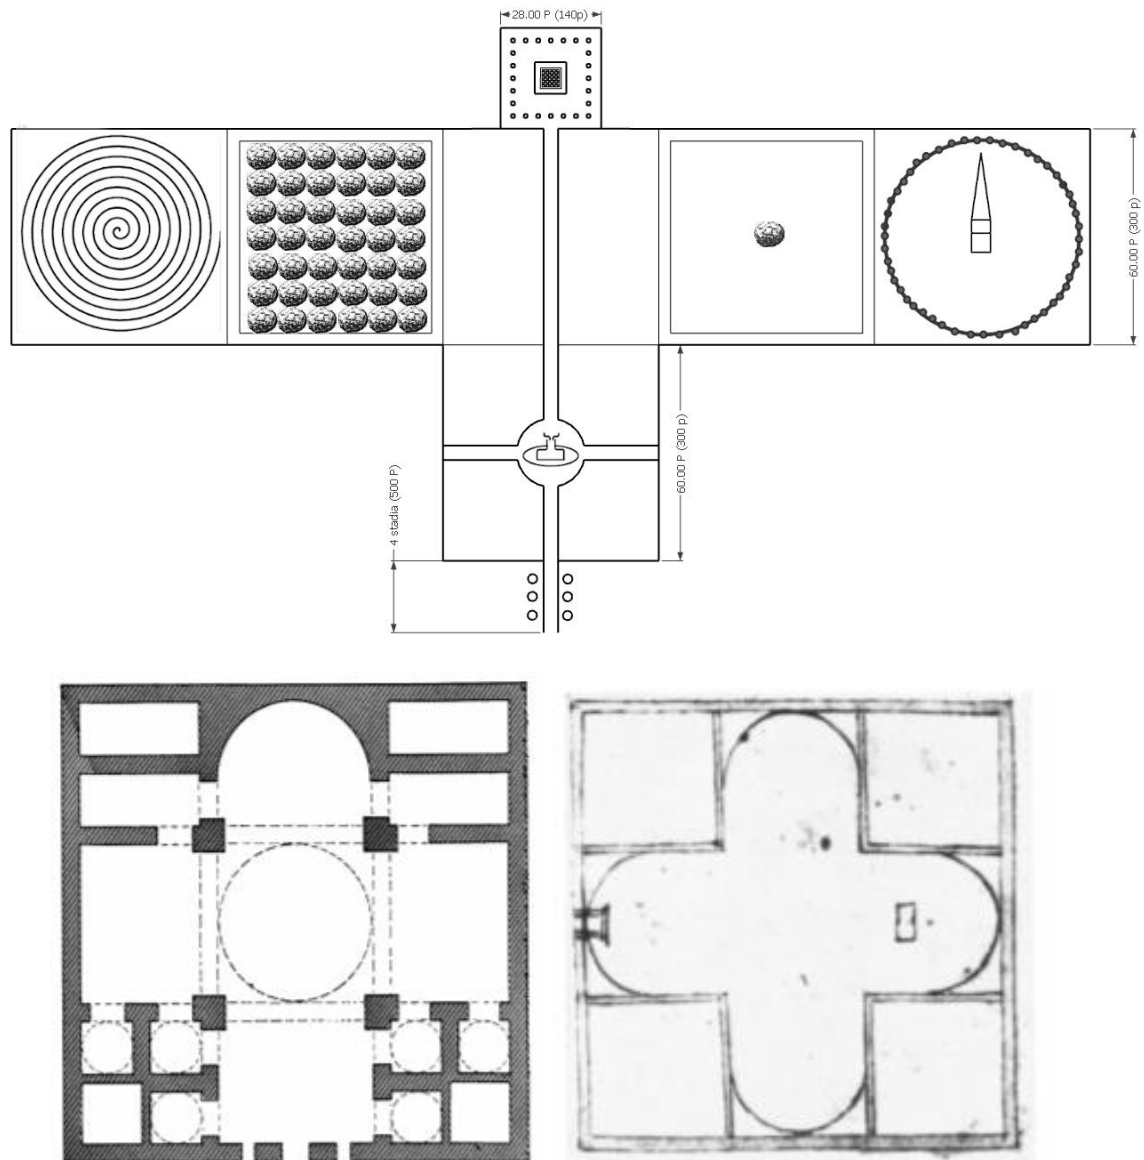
Plan of the Eleuterylida gardens Fig. 6.8) Redrawn plan of a Benedictine monastery Fig. 6.9) Plan of a market church
